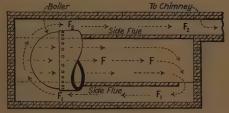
Wheel-draft circuit of the egg-end boiler.
